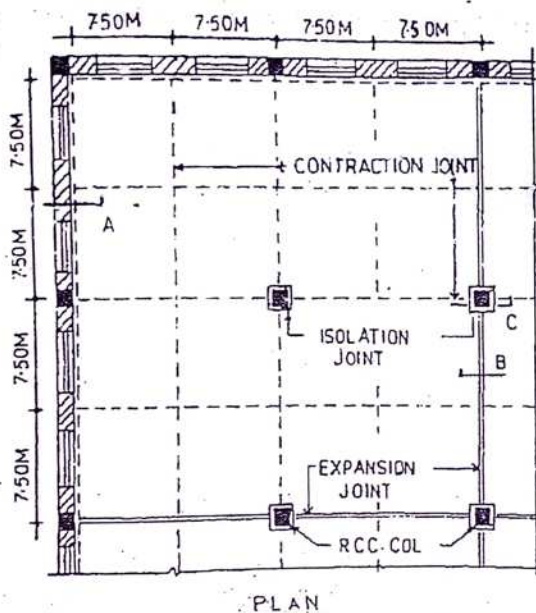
Plan showing location of contraction, expansion and isolation joint
